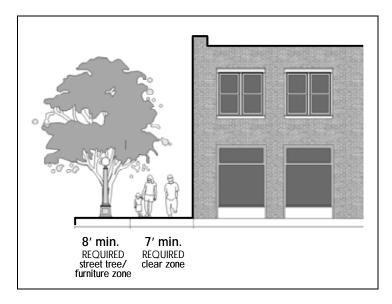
TOD Core Transit Corridor sidewalk requirements. Street trees are required along TOD Core Transit Corridors with an average spacing not greater than 30 feet on center.
